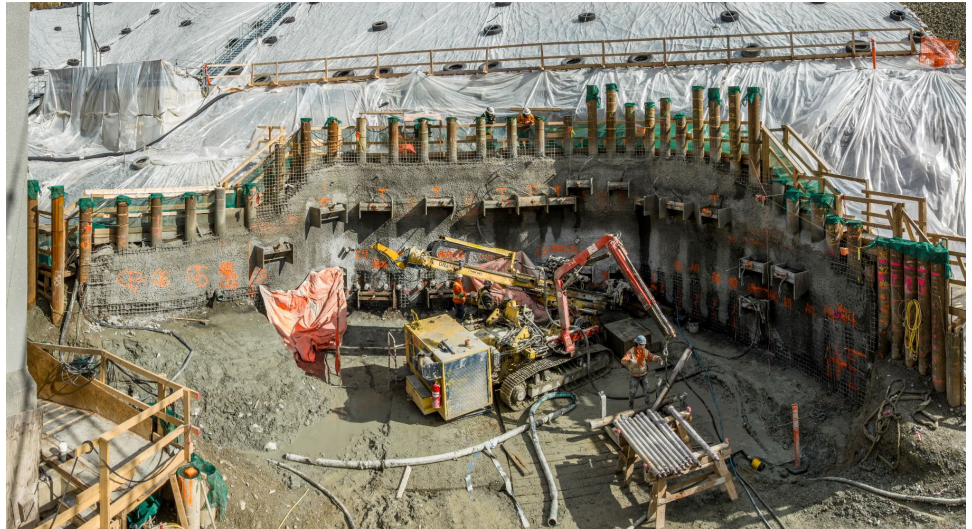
Work underway to grout and shore the walls of the excavation to remove loose clay deposits in the left abutment slope at Ruskin Dam.
